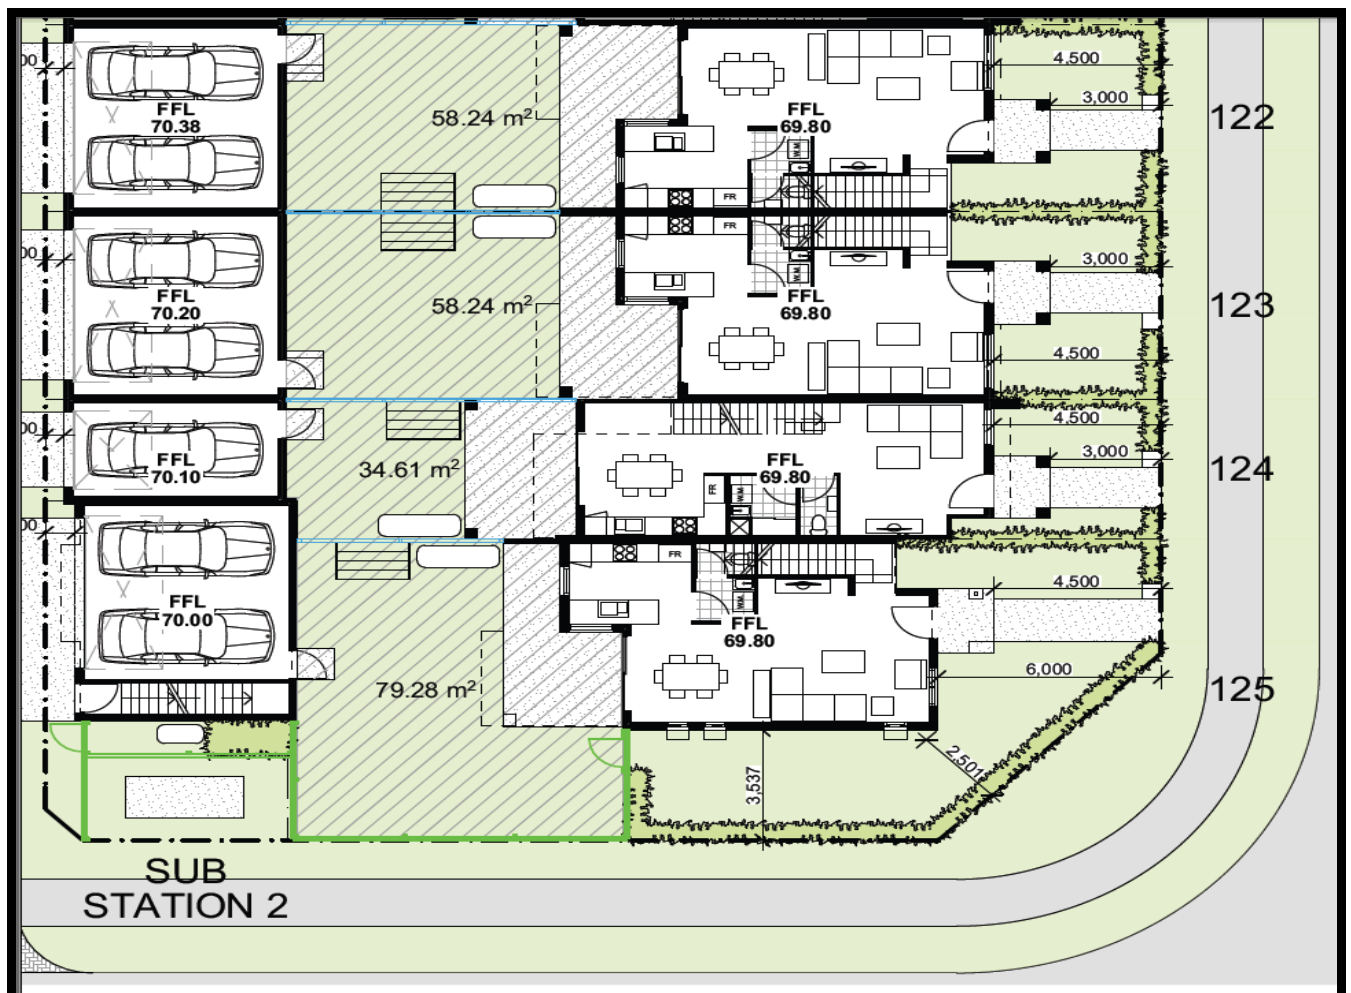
Floor Plans showing access via a pathway at front and rear garage to dwellings along Sixth Avenue
